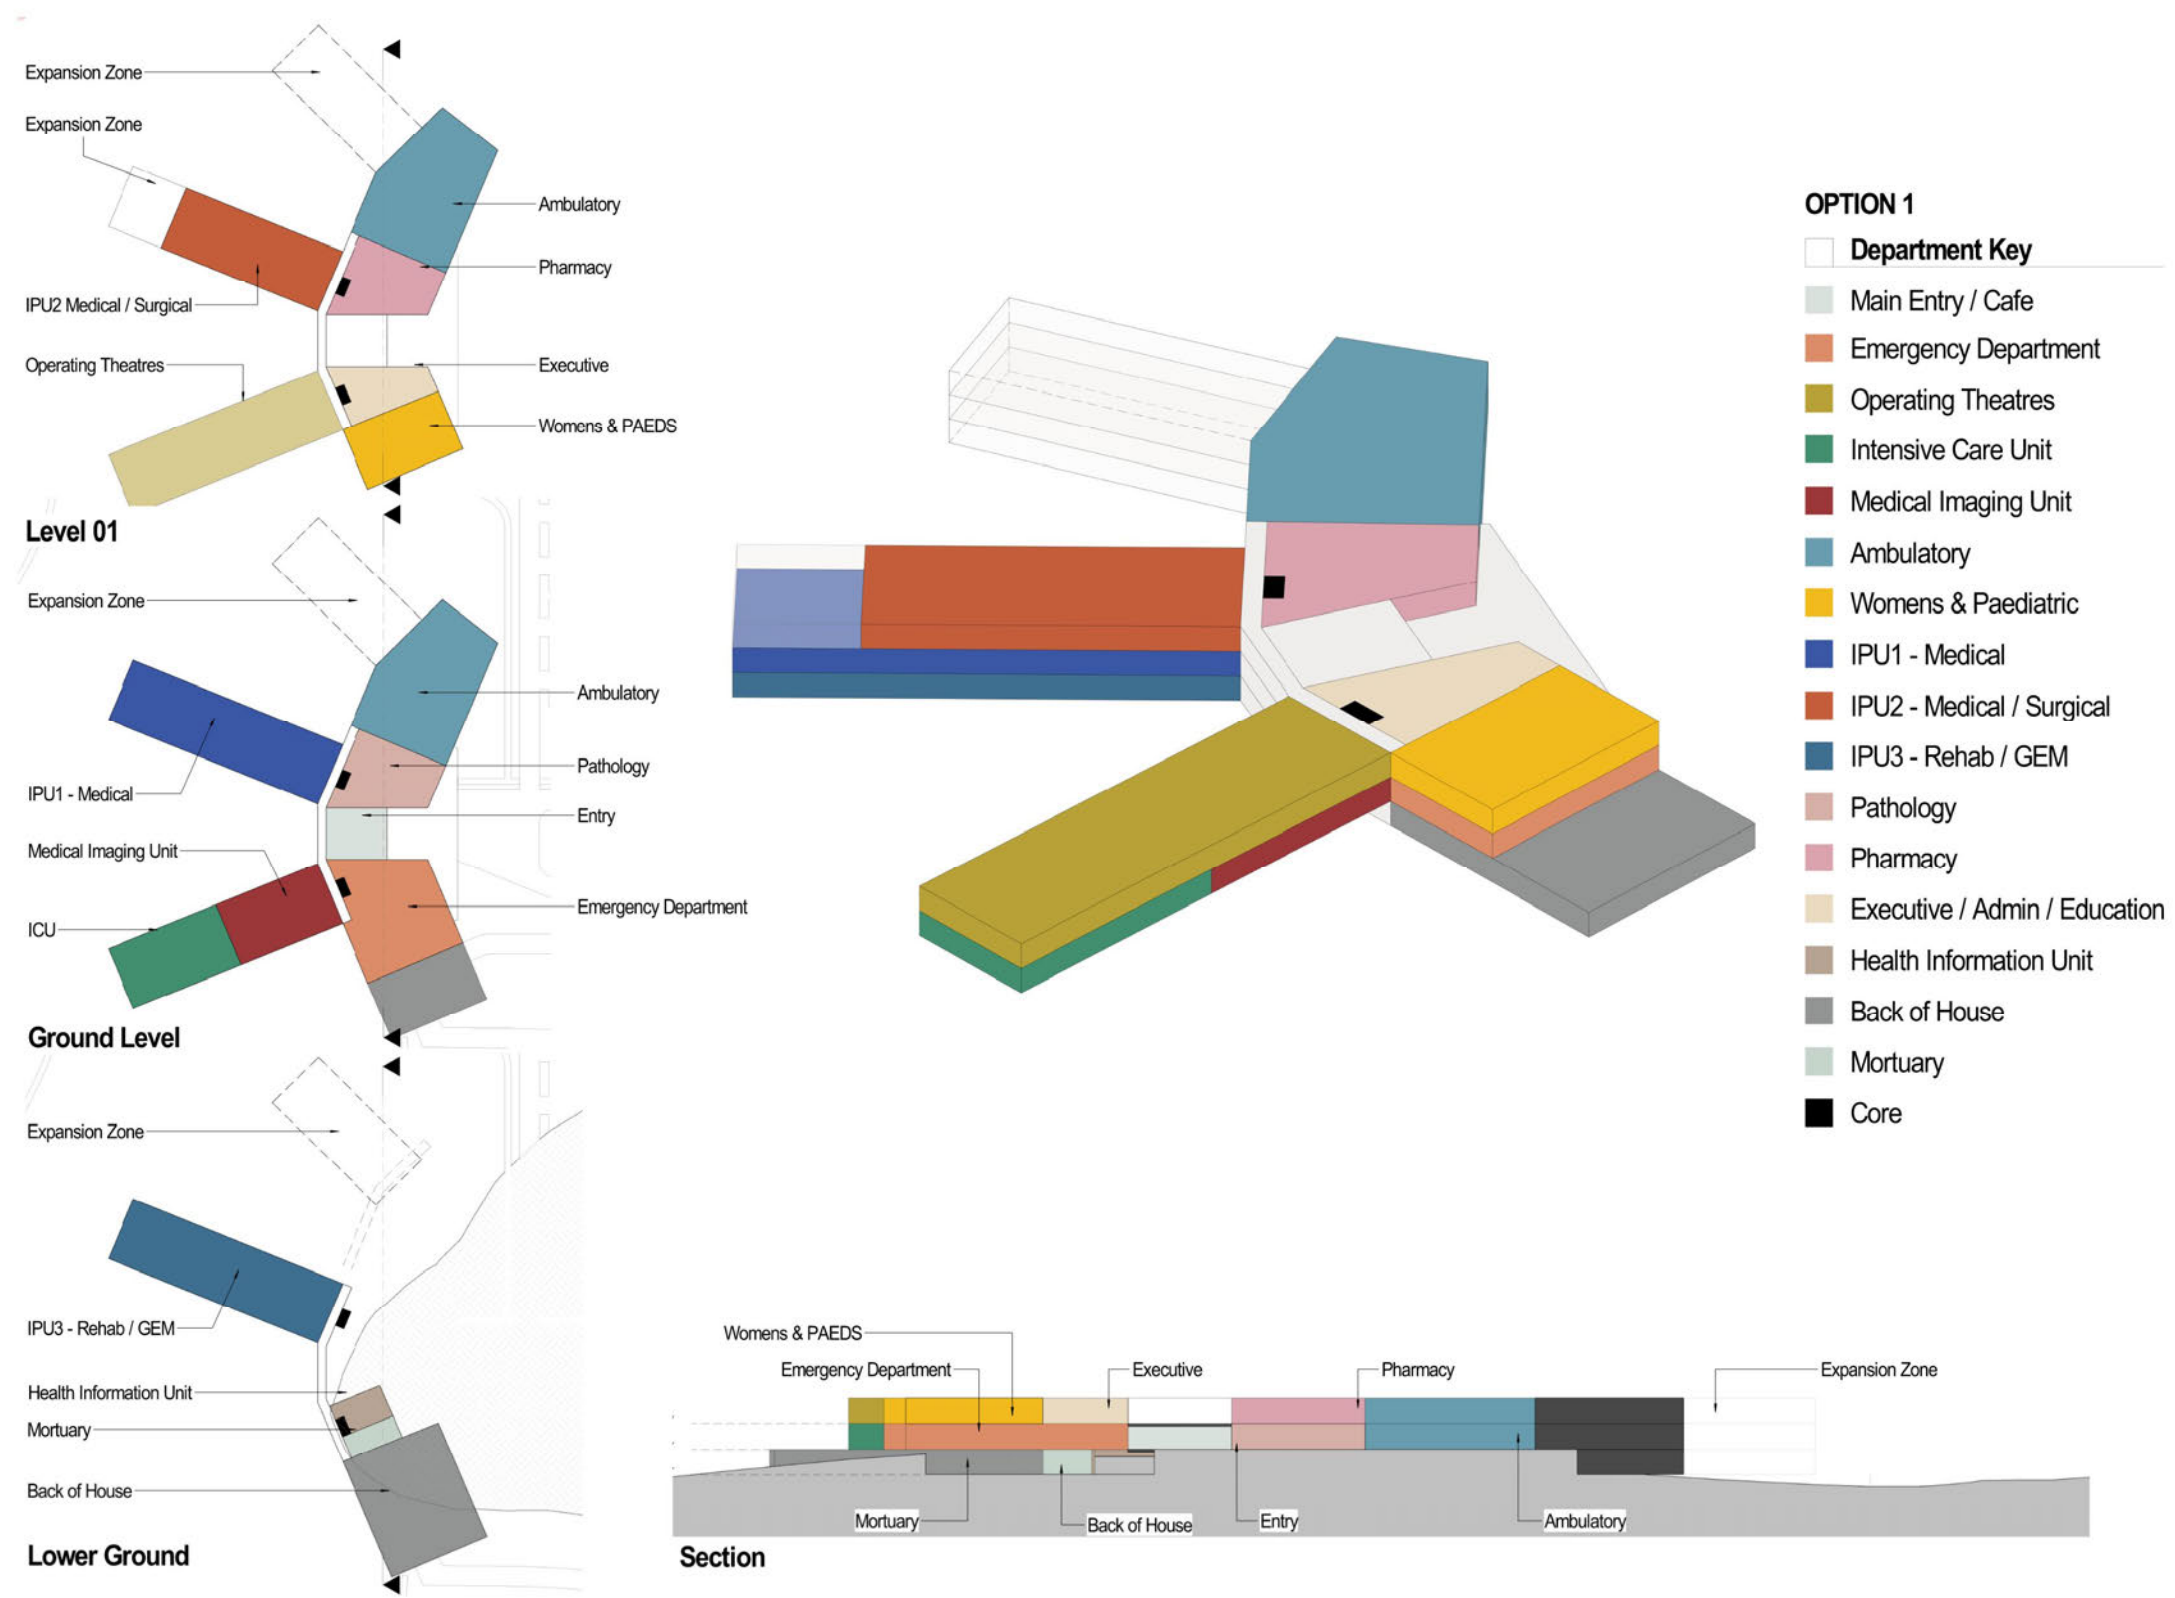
Option 1 – Hospital Street – Department Adjacencies - Plans
